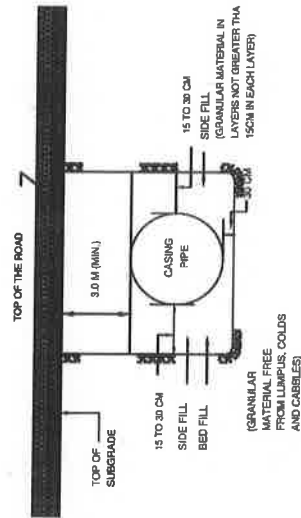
INSTALLATION OF CASING PIPE FOR CROSSING THE ROAD
